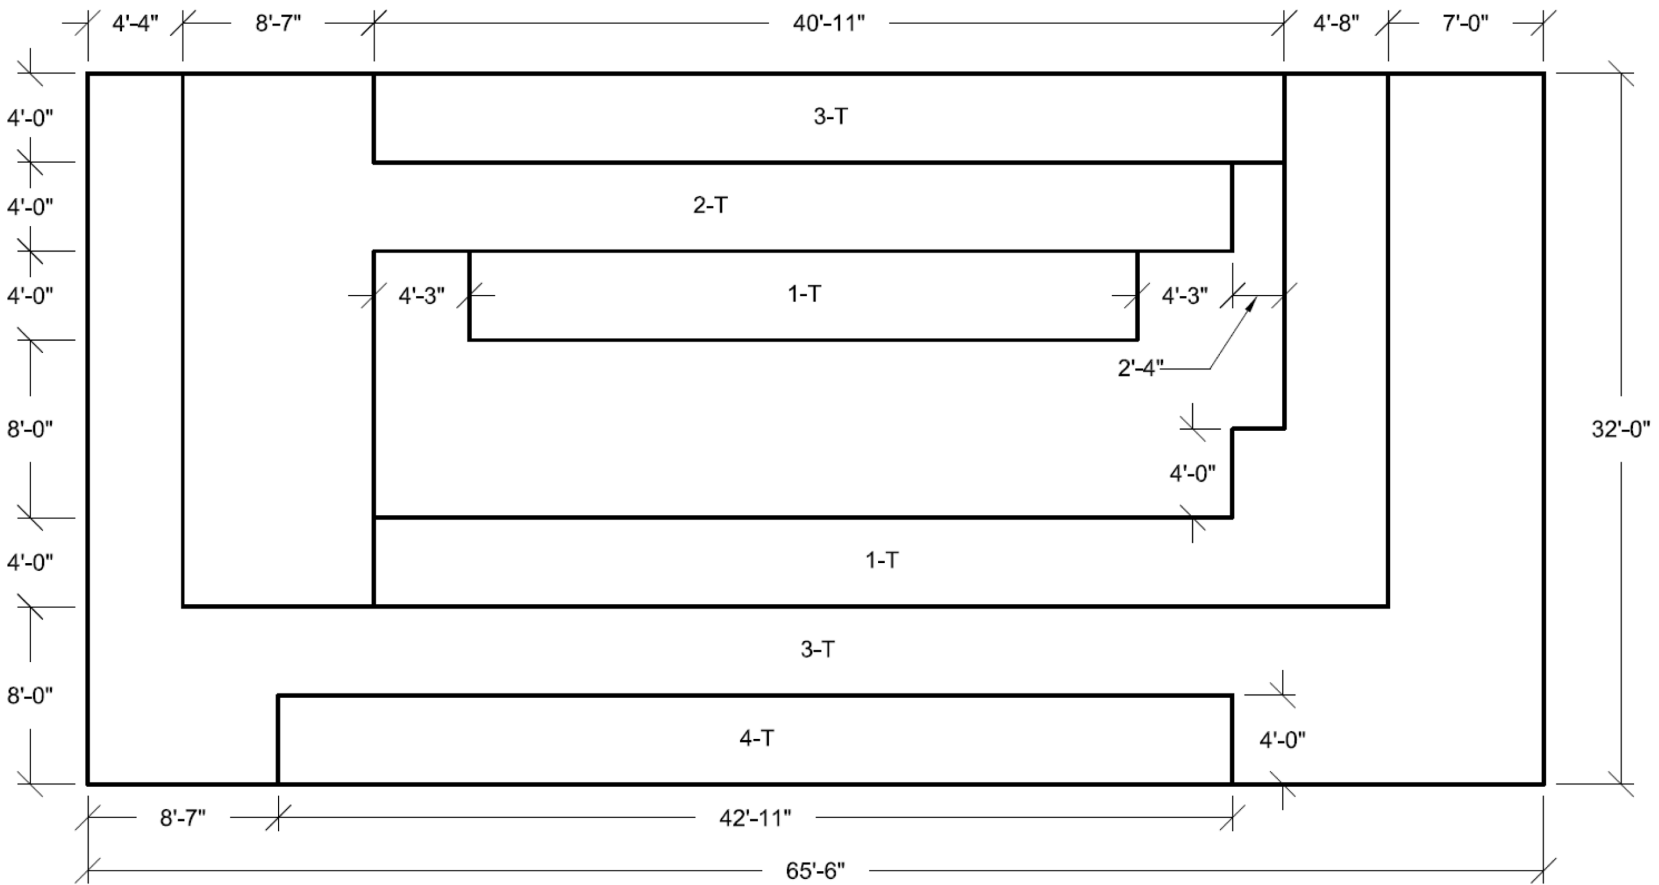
H.6-167 DGFOSV Wall 7 Looking From Outside Transverse Reinforcement Zones
